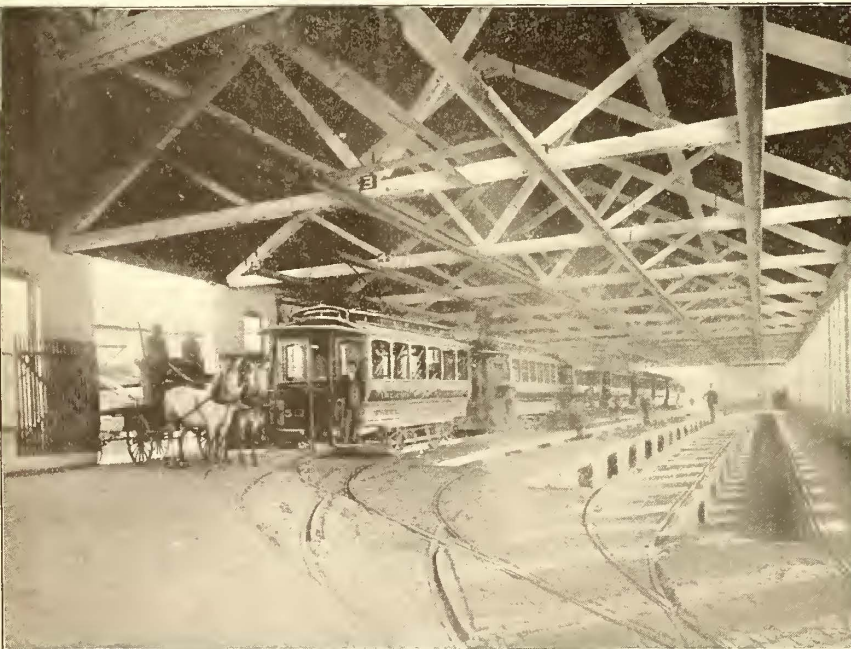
GENERAL VIEW OF CAR HOUSE INTERIOR—WHEELING ELECTRIC RAILWAY CO.
